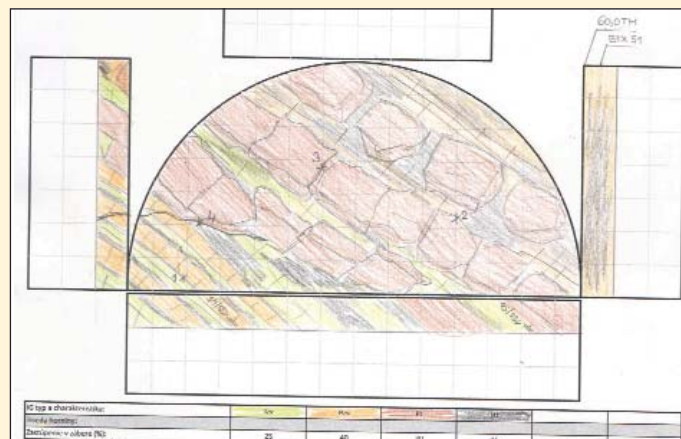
Milochove tunnel, excavation face formed by alternating layers of claystone and sandstone
